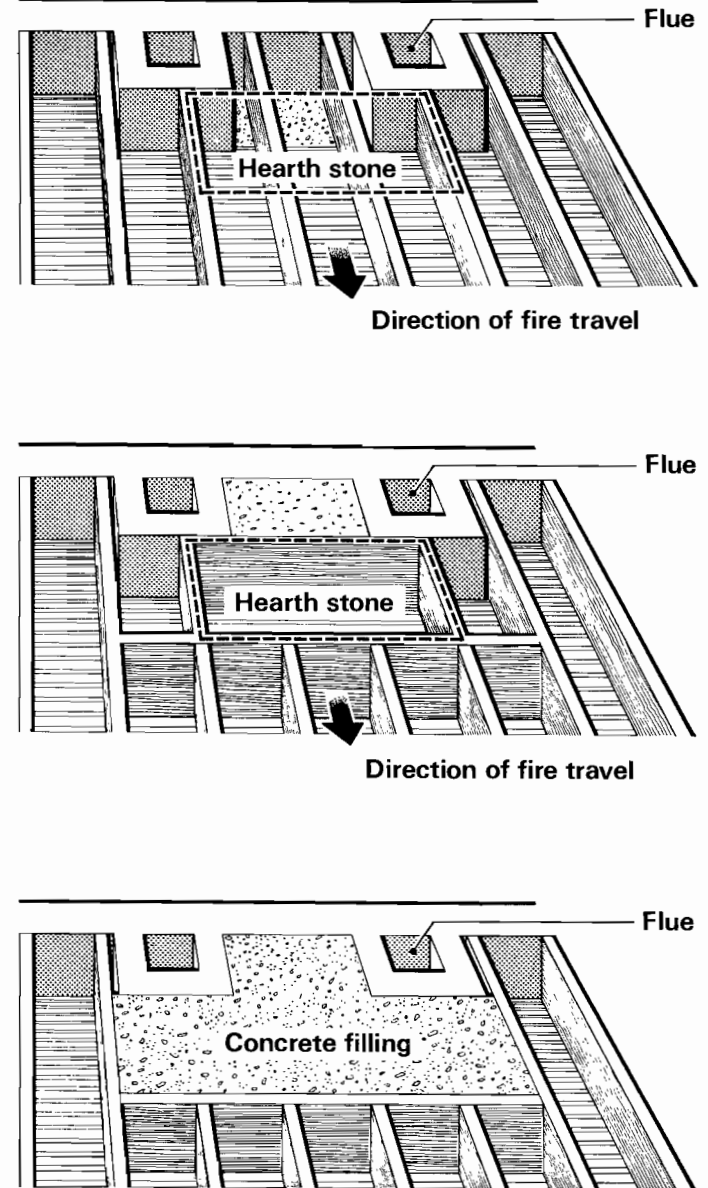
Above and centre: methods of laying hearthstones on the joists which are first covered with tongued and grooved boarding. Below: construction with a trimmer arch.
